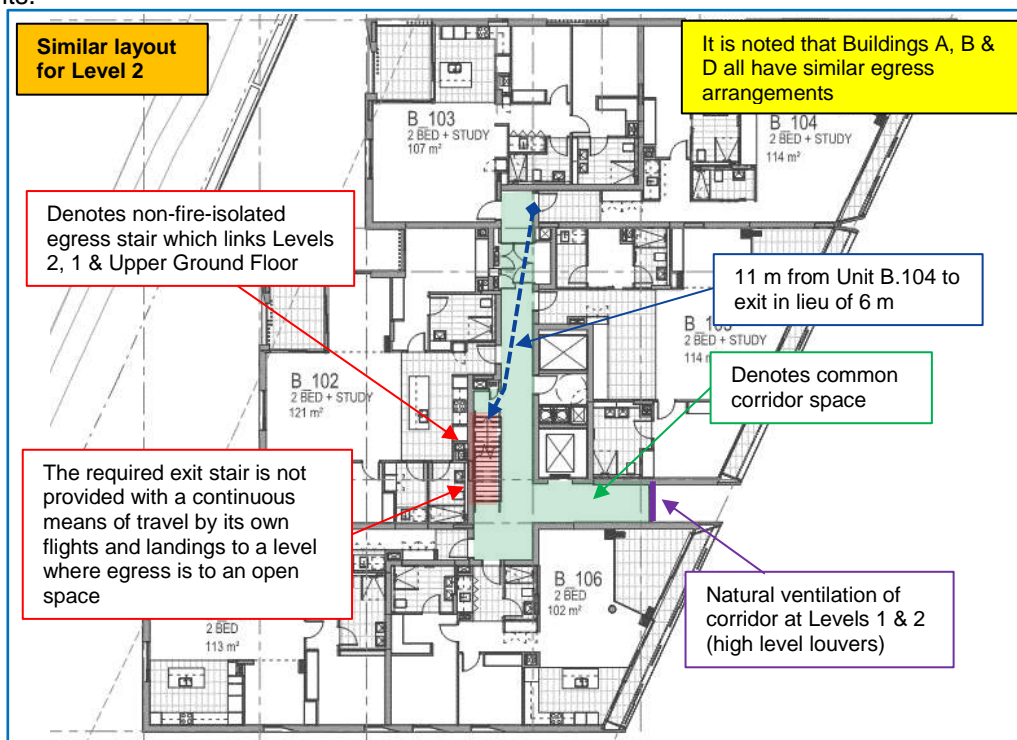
Building B Level 1 (sample layout) – extended travel distance to an exit greater than 6 m
